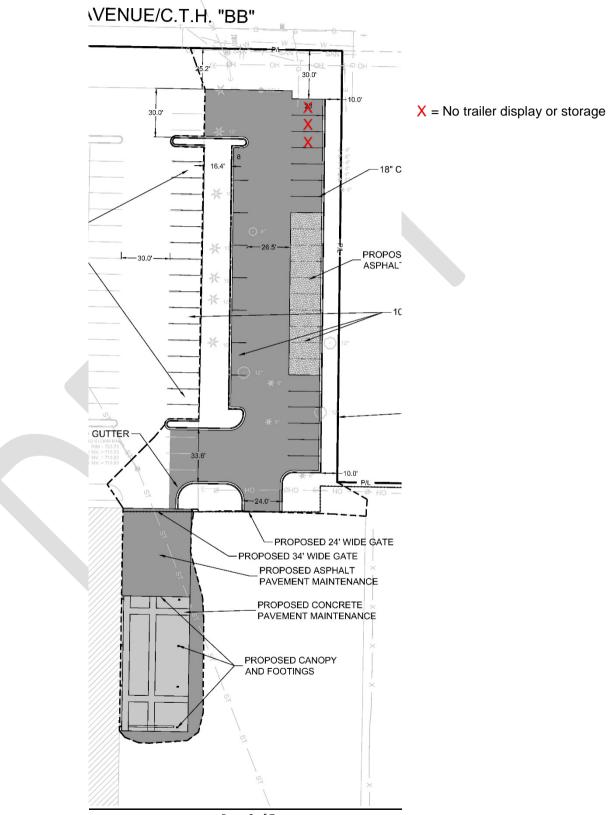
EXHIBIT A: SITE PLAN REVIEWED JANUARY 12, 2021 (ENLARGED)
